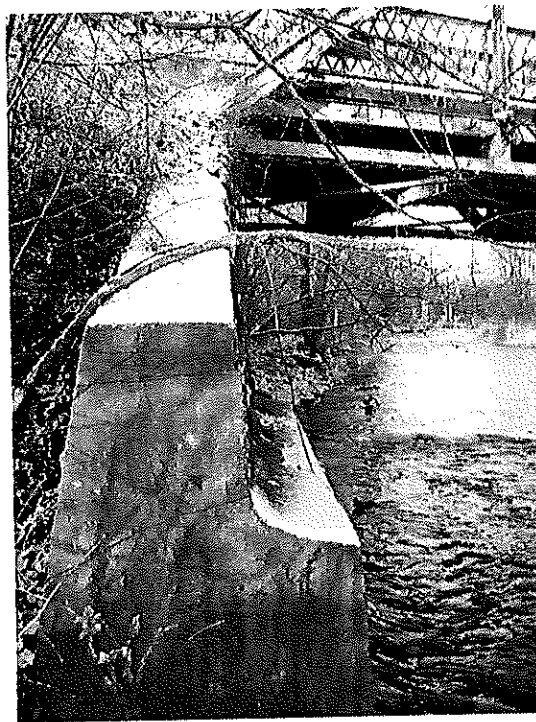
Abutment and Wing Wall on the West Side of Collingwood Street Bridge on the North Bank
